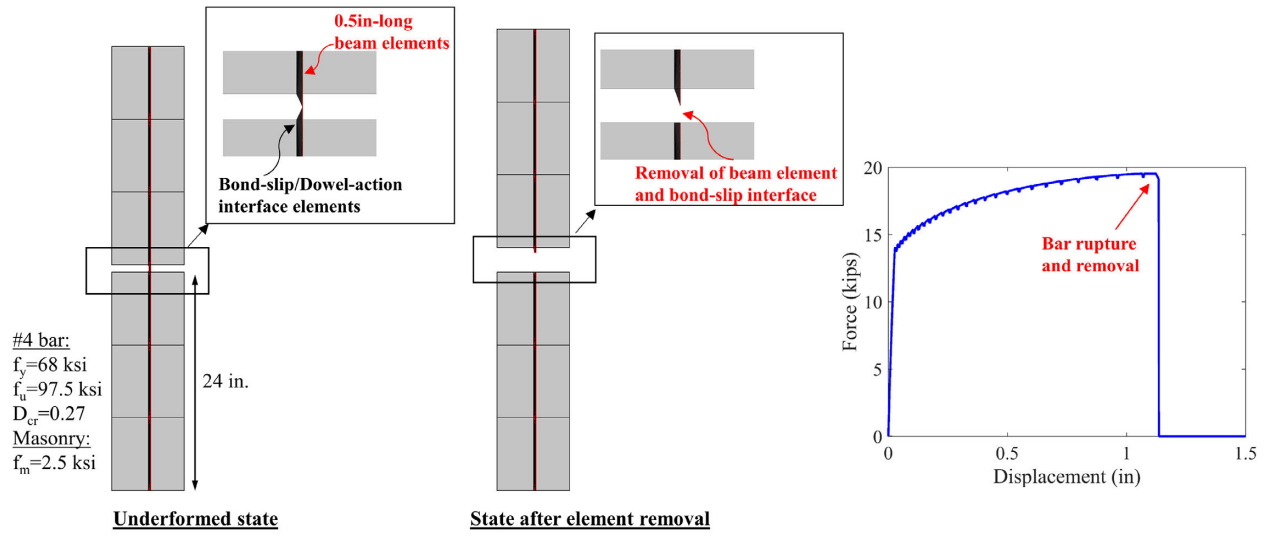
Element removal due to rupture of a reinforcing bar embedded in masonry.
